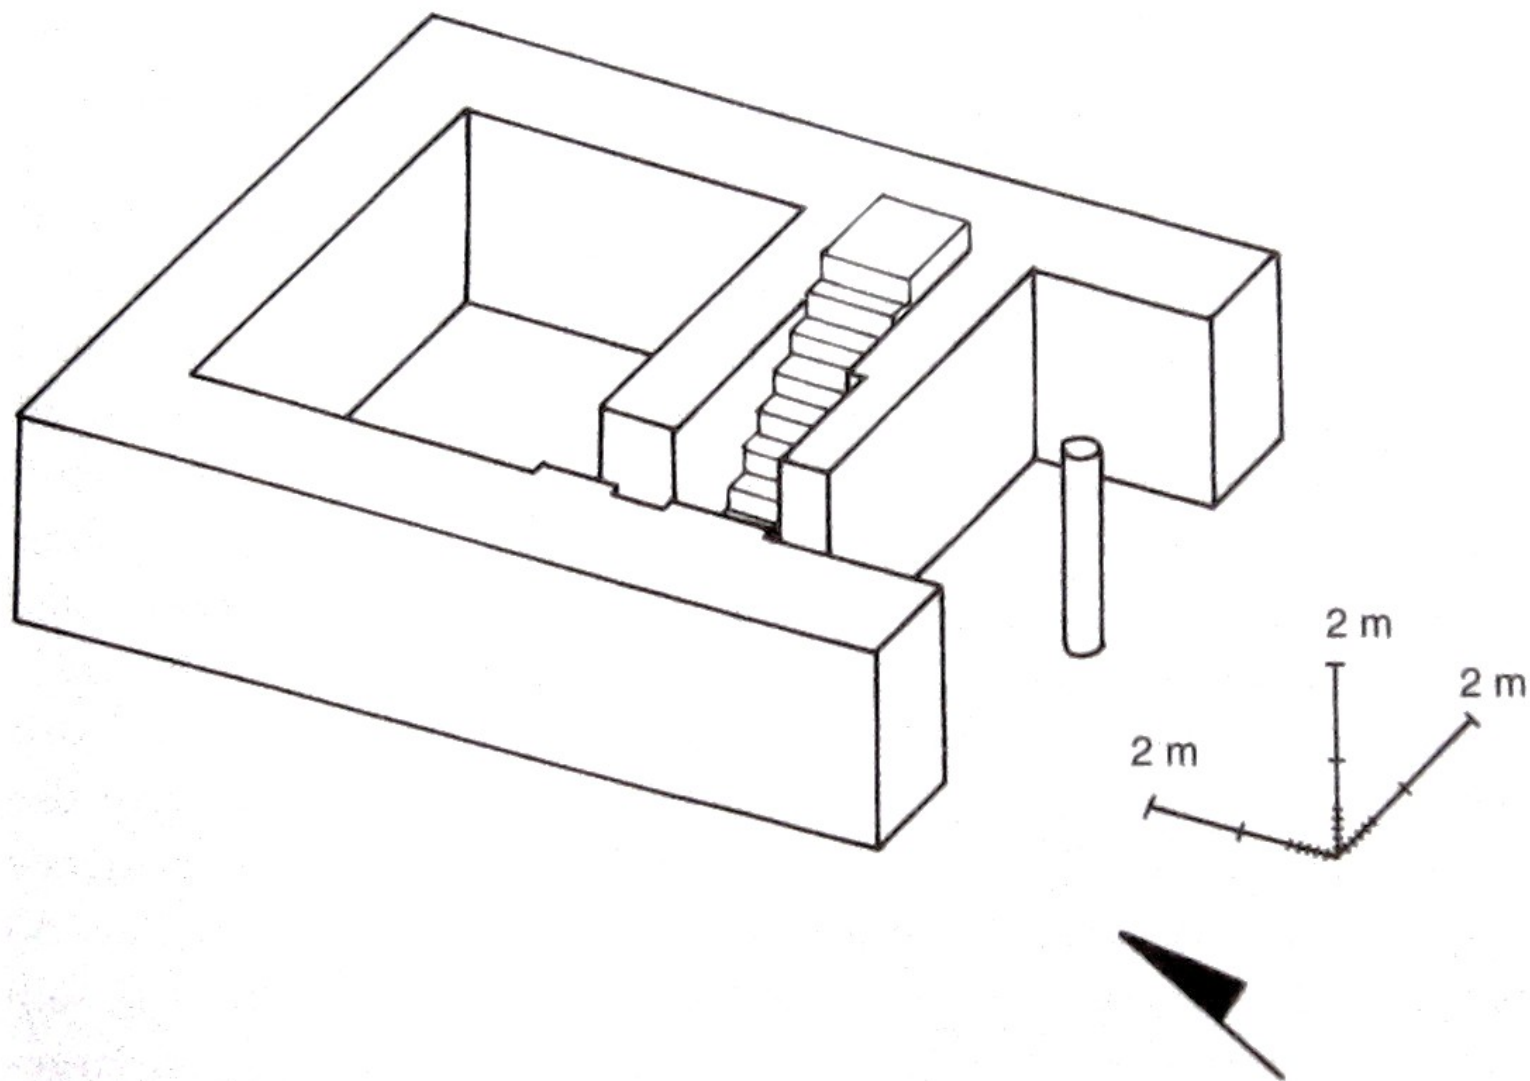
Reconstruction of House A at Tsoungiza, EH IIA. Drawing by the author.
